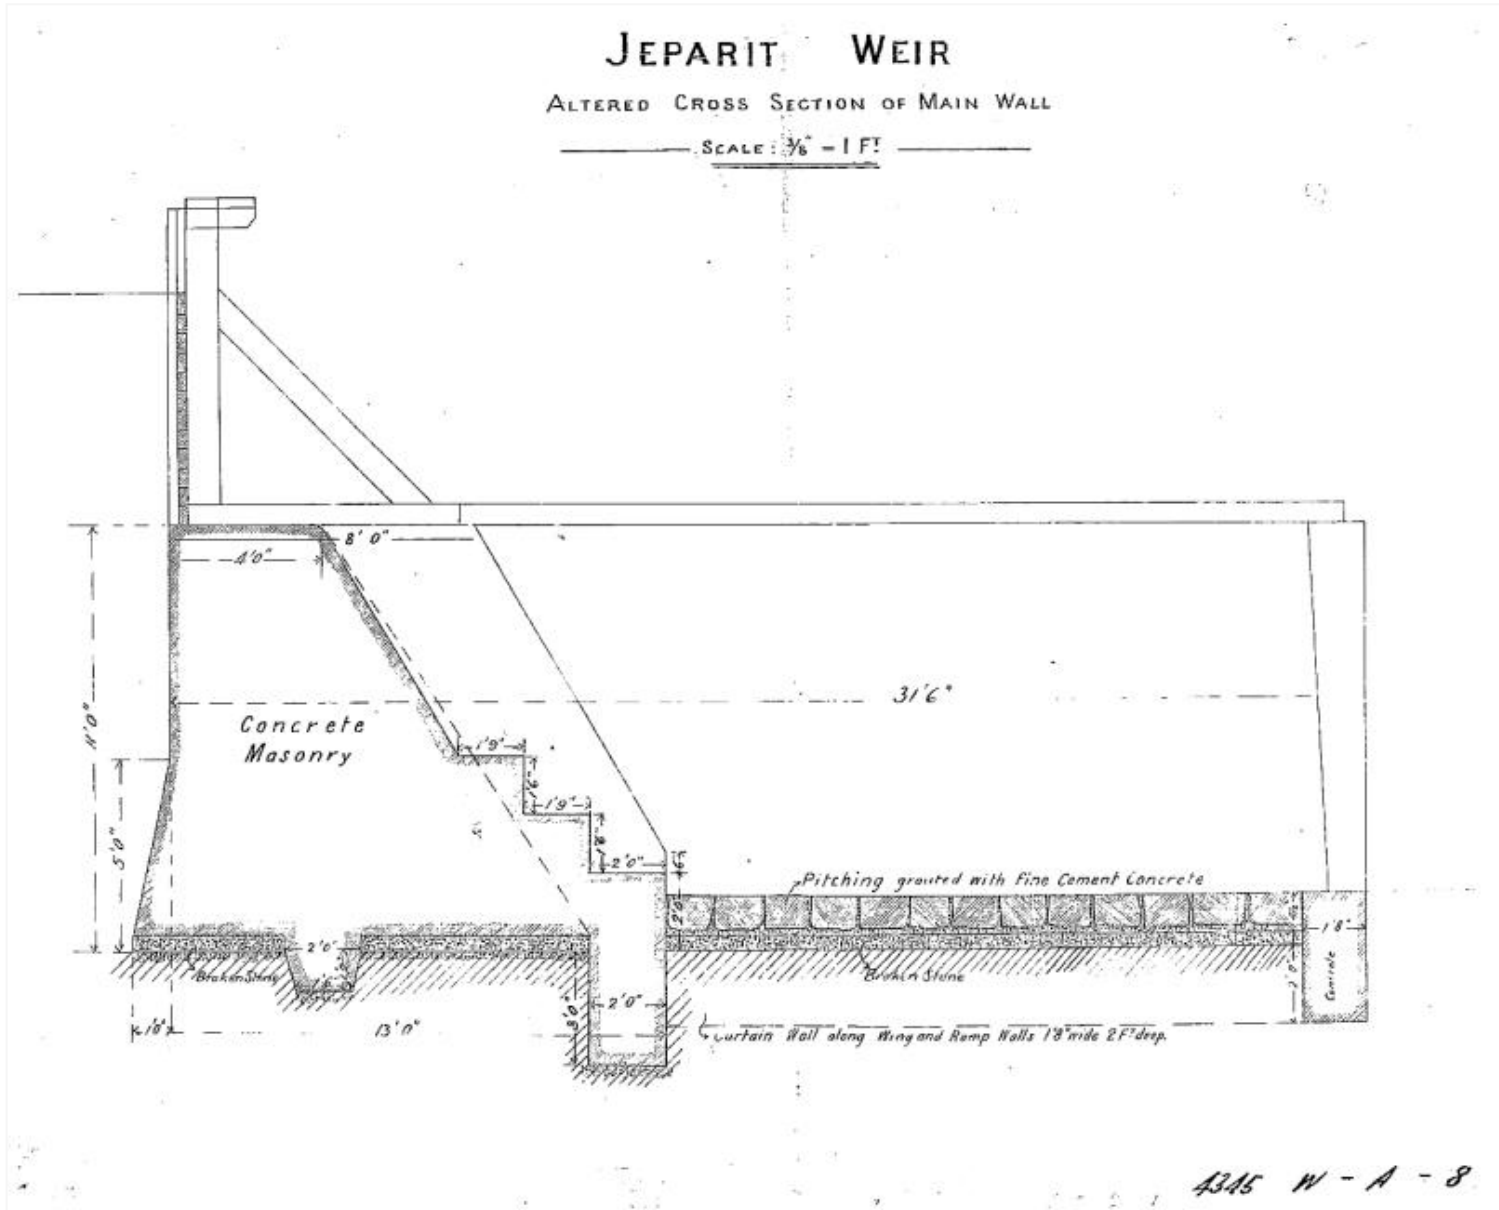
Jeparit Weir main wall cross-section drawings (Source: Hindmarsh Shire Council)
